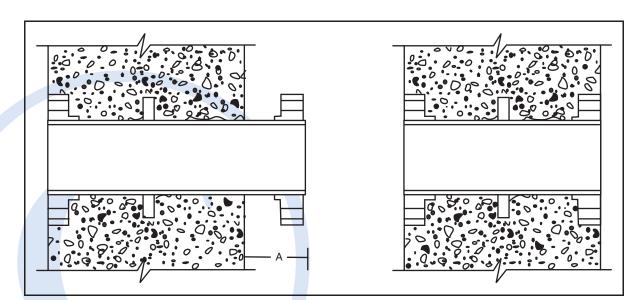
Typical flanged wall pipe installations (see Table C.2 for "A" dimensions)
